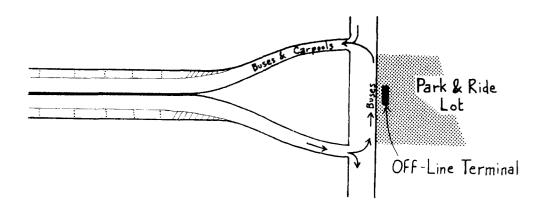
A: Typical Site Plan for Terminal Station, Wide Guideway for Buses and Carpools
